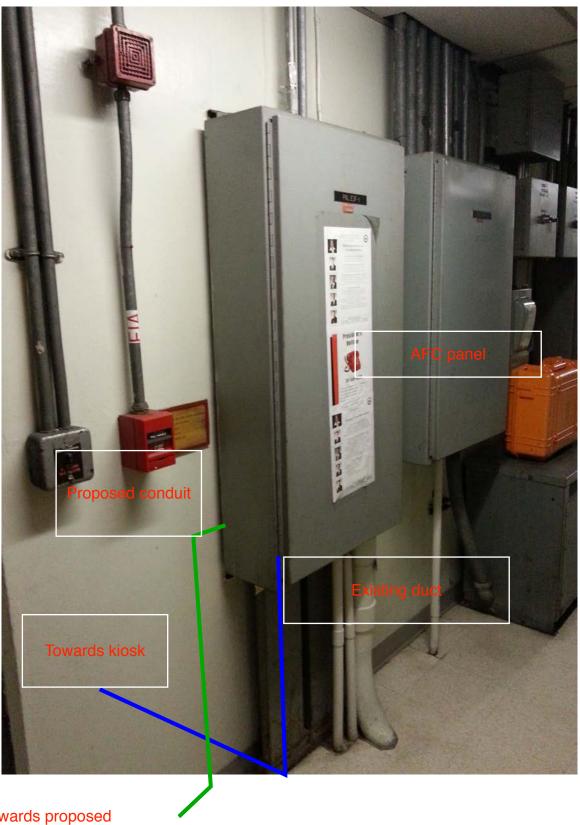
K07 Dunn Loring: Proposed and Existing runs at AFC panel
